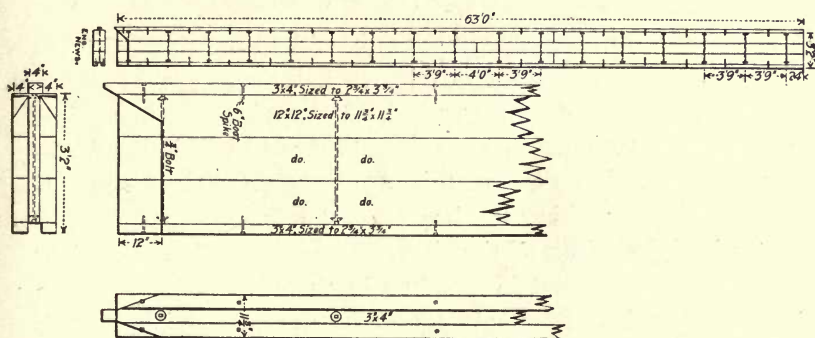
Sheet-piling Used at the Harlem River Tunnel.
